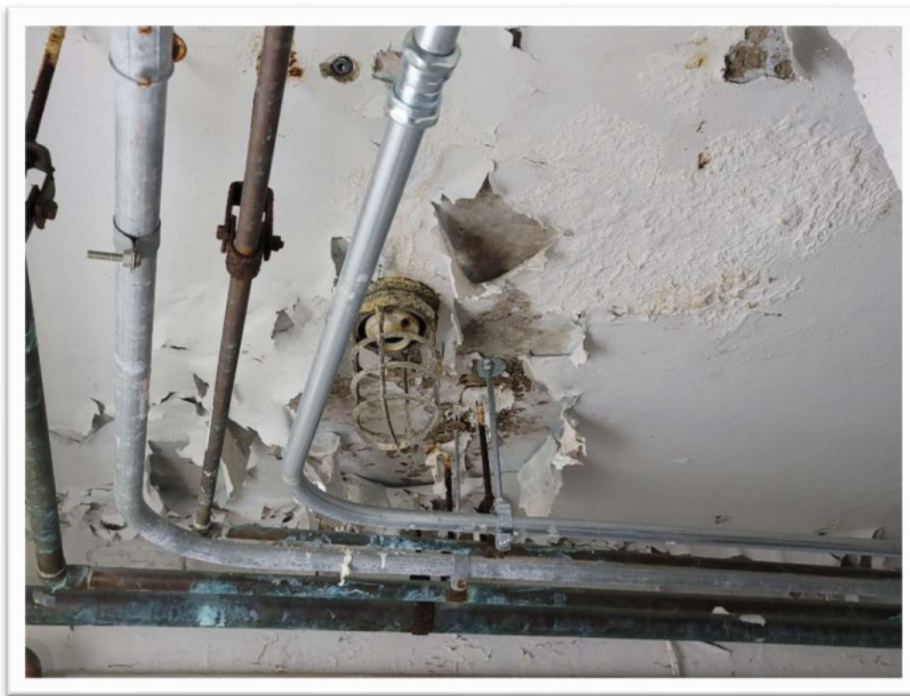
Severe peeled painting through the ceiling from moisture damage.
